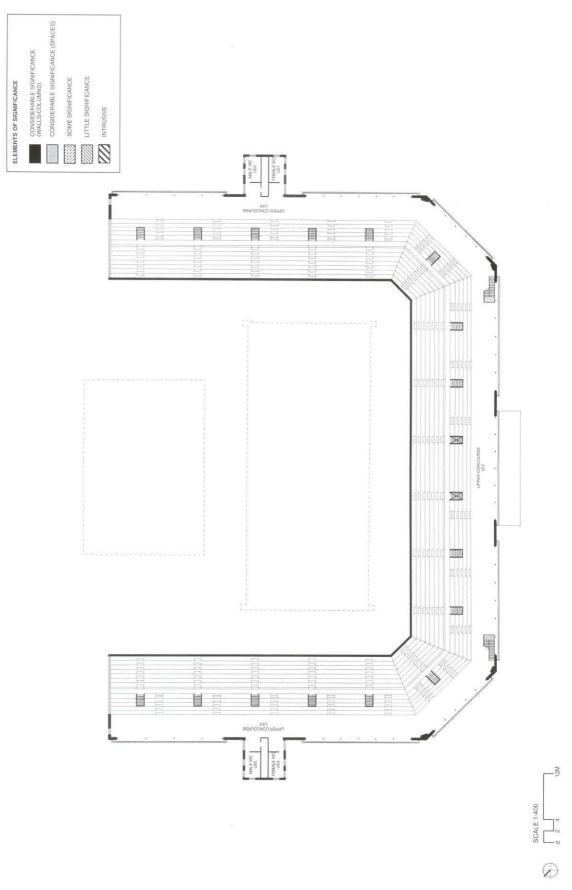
Beatty Park Leisure Centre – Upper Floor Plan (Elements of Significance).
